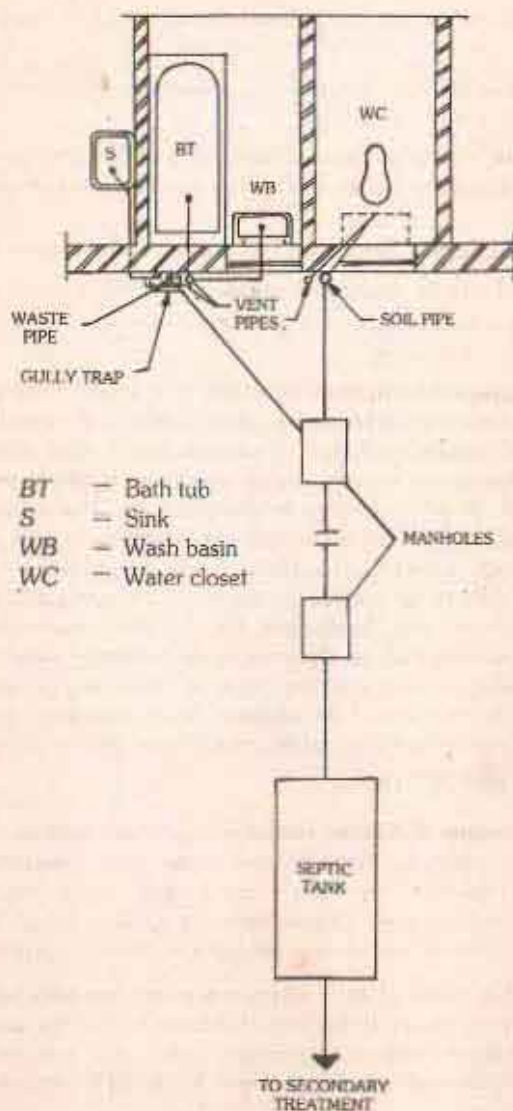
Typical Layout of a Septic Tank Sewerage System
